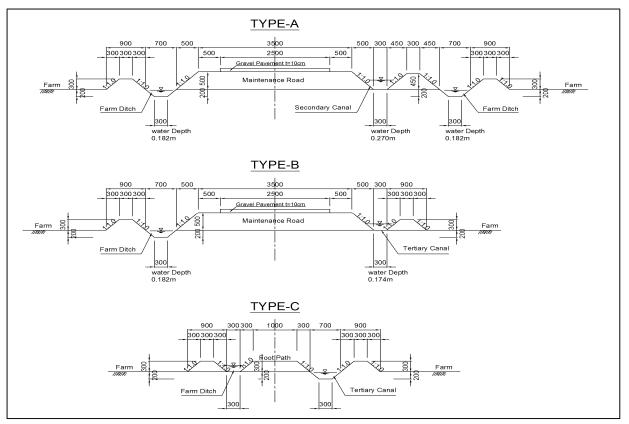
Typical Cross section of Irrigation and drainage Facilities in Command Area
